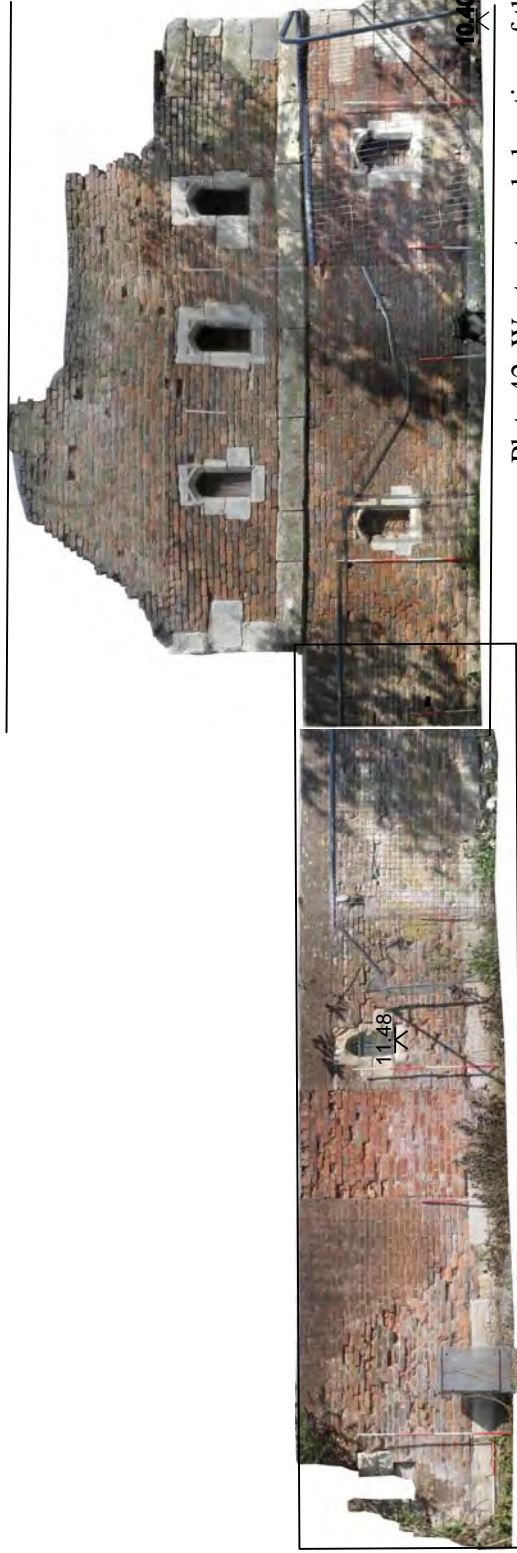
West external elevation of the Great Stable and the adjacent South-West range, OA
